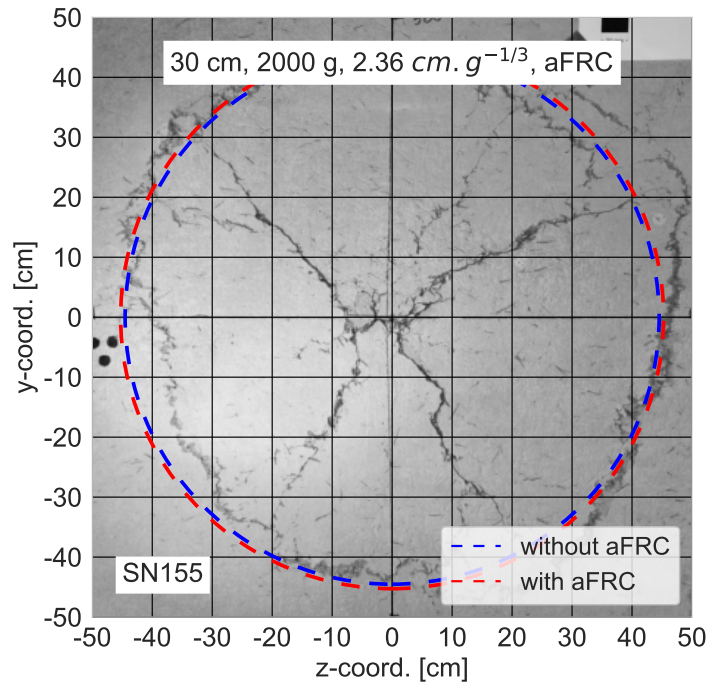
Protective surface of the concrete slab with an additional layer of fiber reinforced concrete
